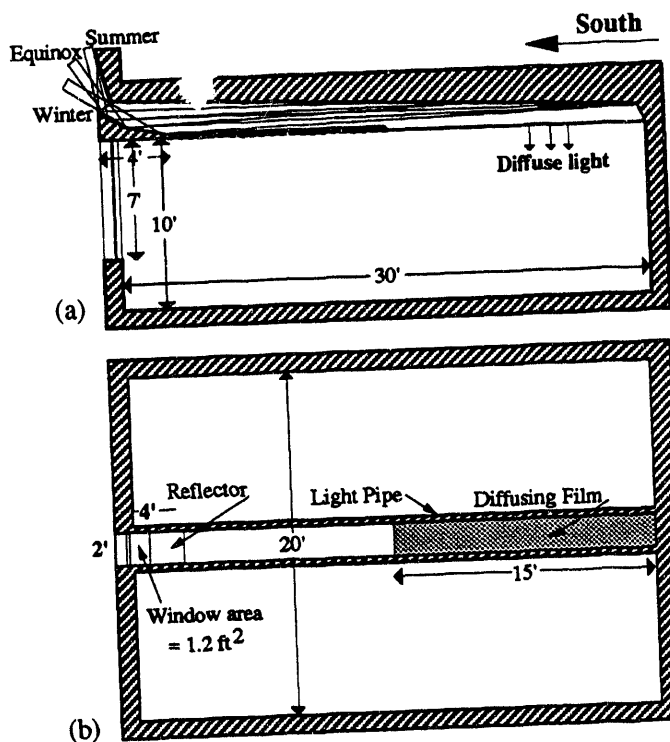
South facing light pipe: (a) Section along centerline of room, and (b) View plan of light pipe.
